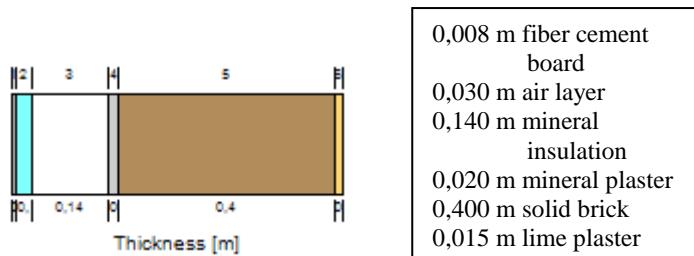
Variant 3 of modernization – Curtain wall (from outside to inside)
